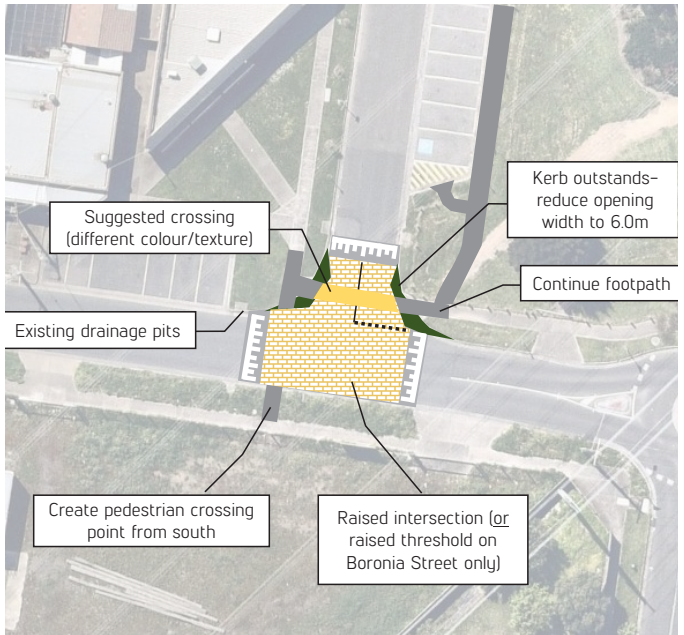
Alexander Avenue / Boronia Street proposed raised intersection (SALT 3, 2022)
